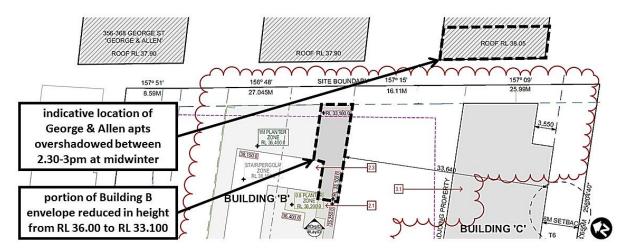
Excerpt of proposed envelope plan illustrating portion of envelope at south-east corner of Building B to be reduced in height from RL 36.00 down to RL 33.10.
